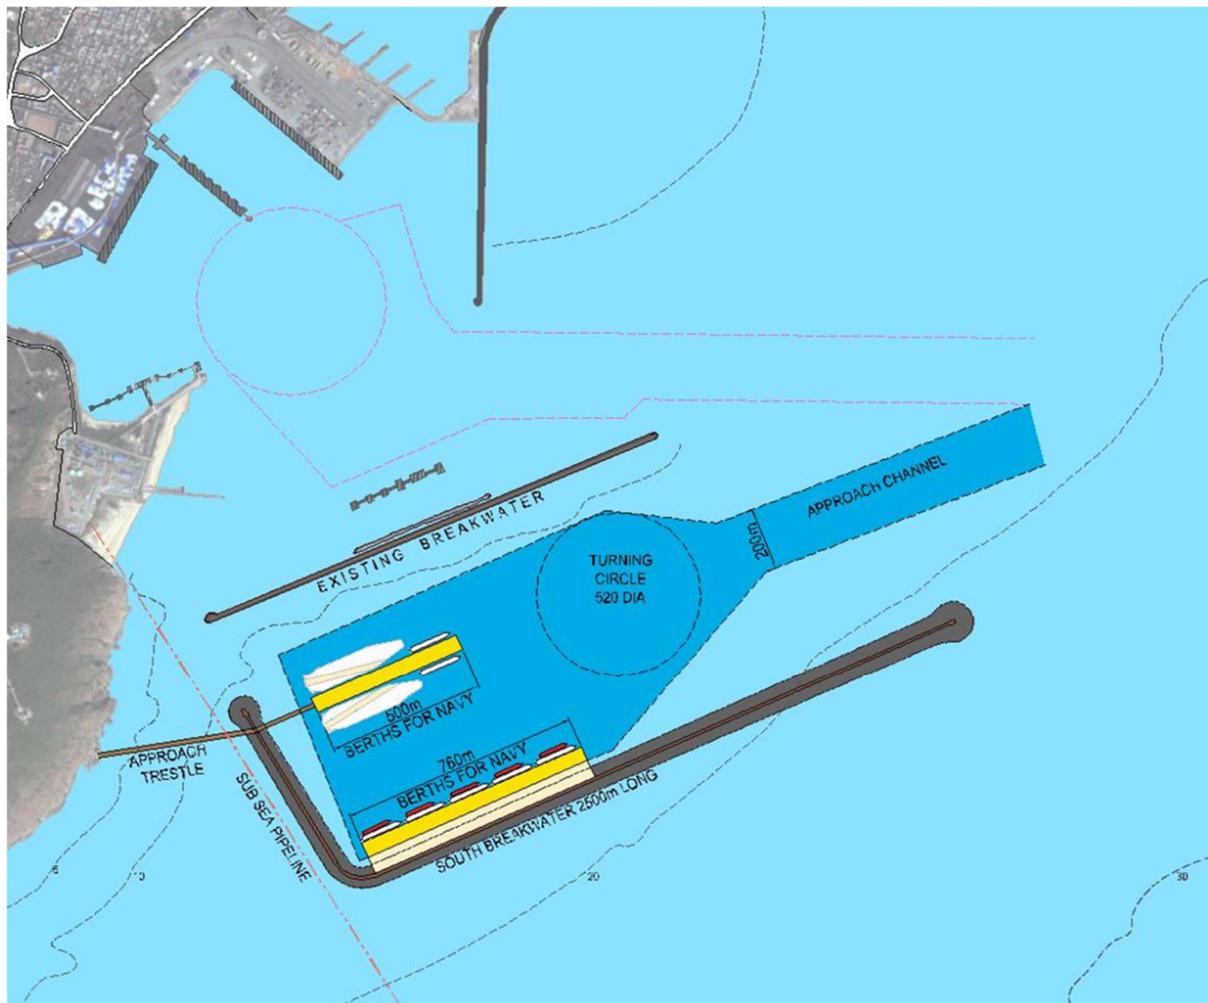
Proposed Outer Harbour - Layout Plan Alternative 1
